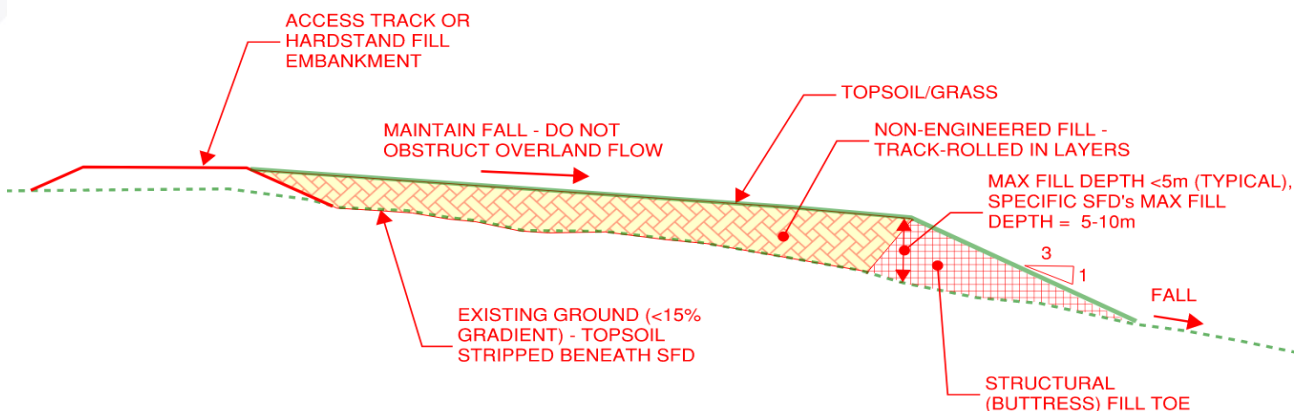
Shoulder Type Surplus Fill Disposal Site – Typical Section
